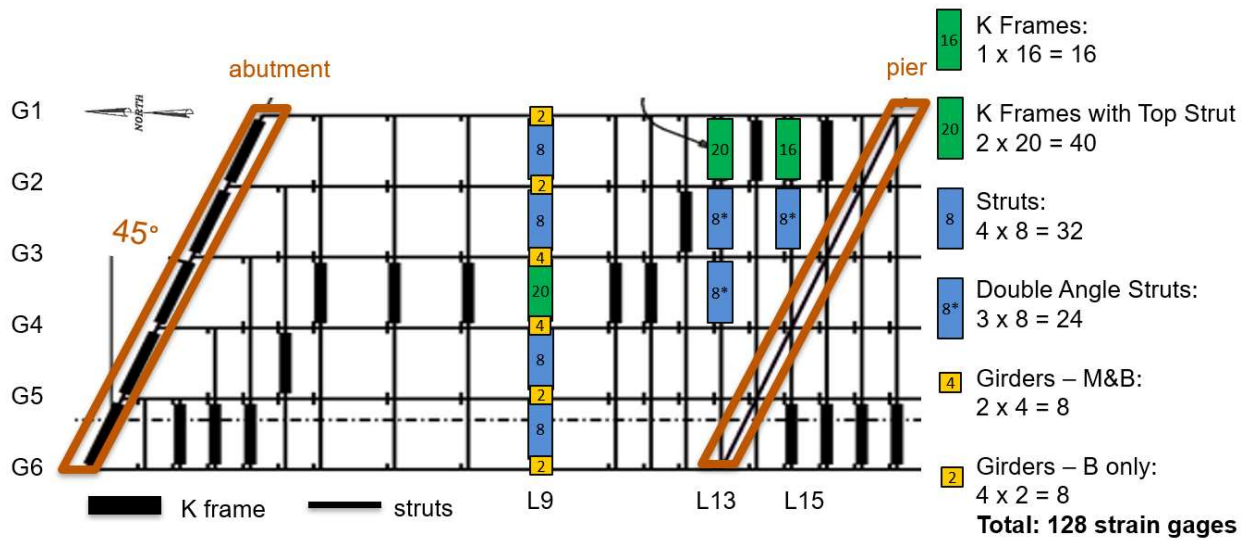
Chisholm Trail Bridge Span 1 Strain Gauge Layout
